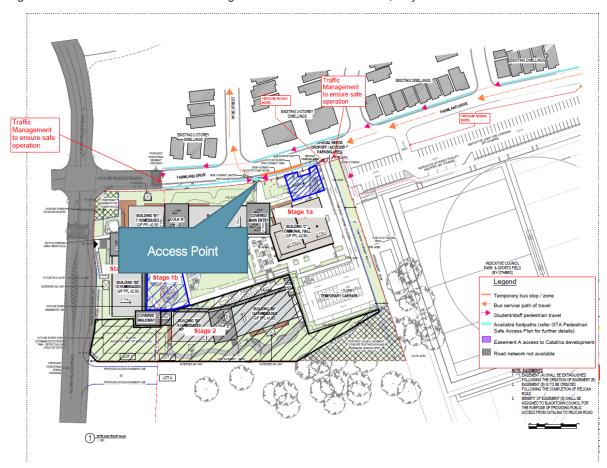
Site Access Plan for Galungara Public School for Term 1, Day 1
